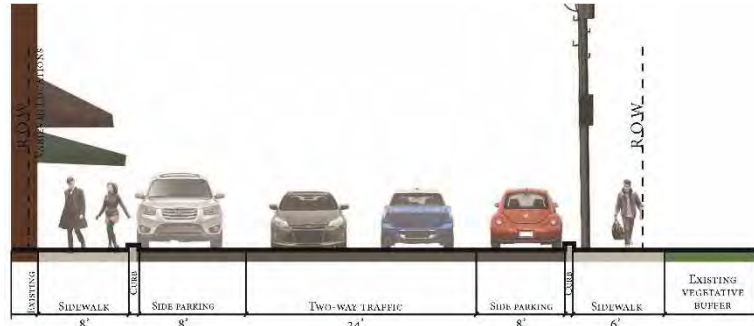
Existing Road R.O.W. looking east on Hill Street
